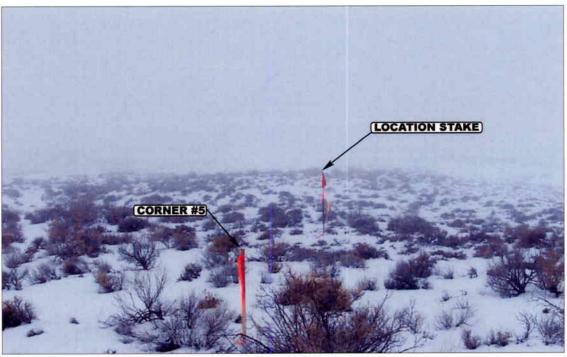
PHOTO: VIEW FROM LOCATION STAKE TO CORNER #5
